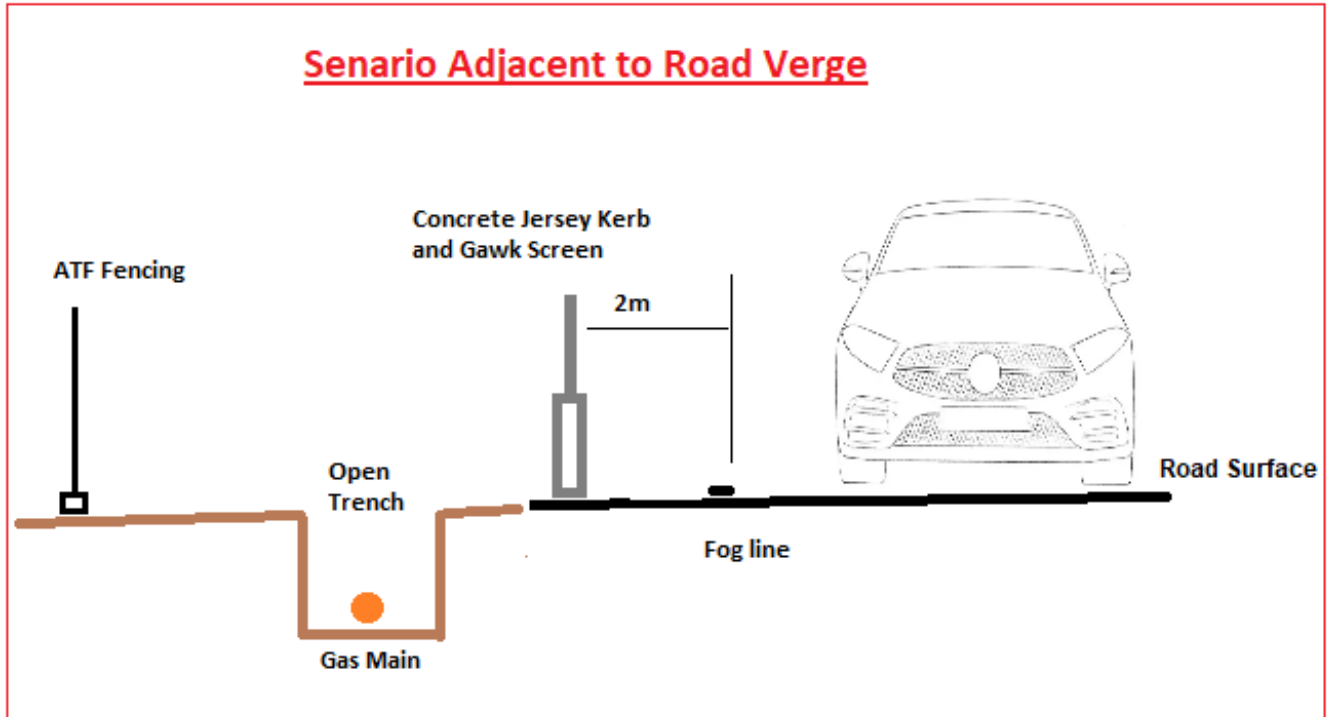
Typical Scenario for pipe adjacent to Road Verge
